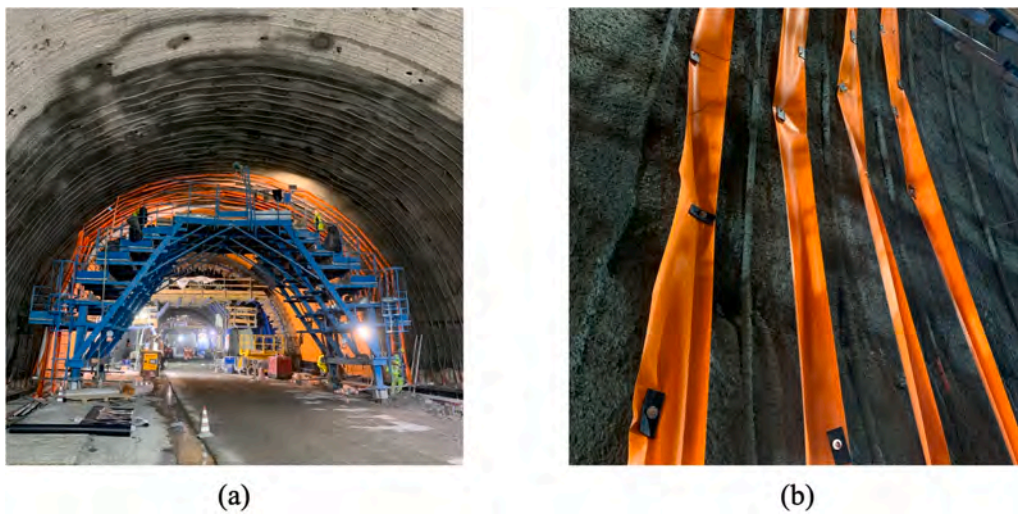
a) Working platform used to install the waterproofing layer, and b) fixing bands nail-gunned along the tunnel wall, between heat exchanger pipe branches.
